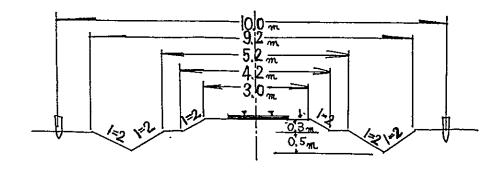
Typical Cross-section of Ballast in Upland Field and Jungle Areas
